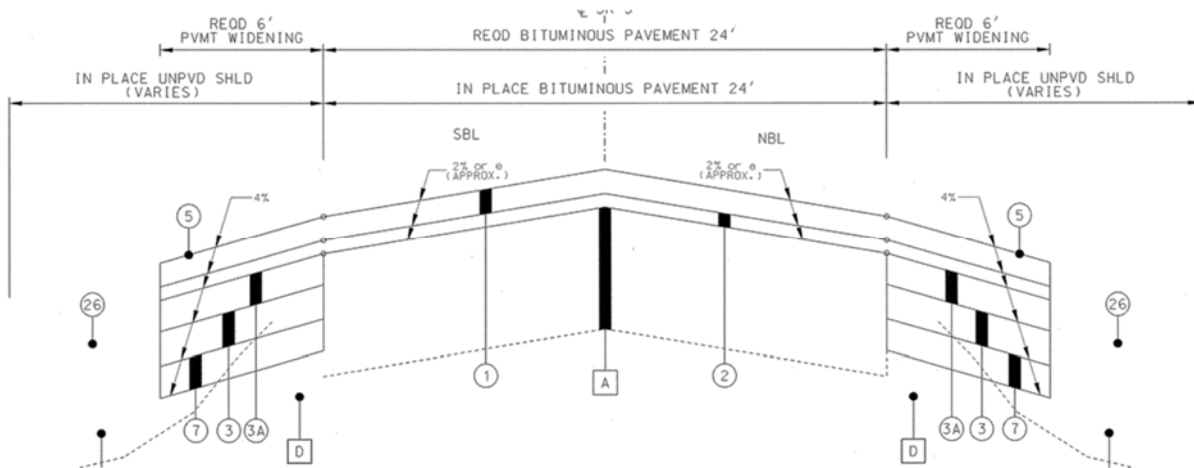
Paved Shoulder Cross Section (ALDOT 2015)
